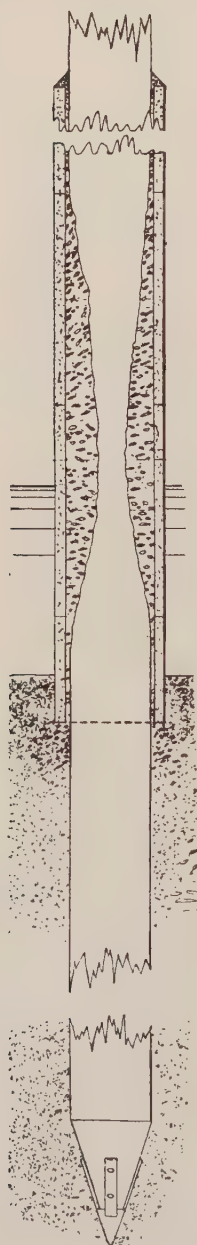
Application of Reinforced Concrete Slabs to Decayed Timber Pile.
